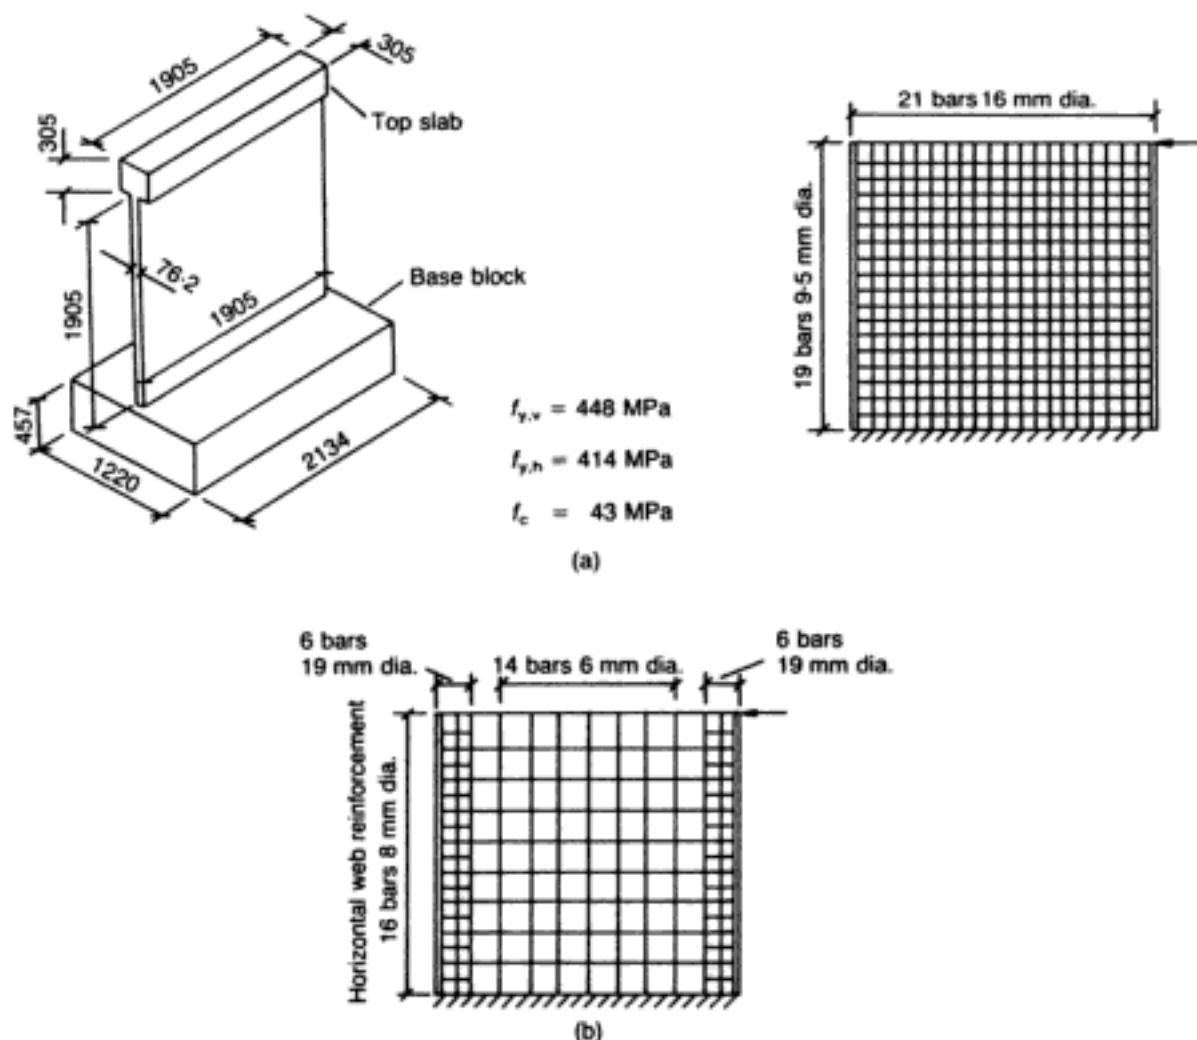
Structural walls: (a) design details of a typical wall investigated in reference 121 (all dimensions in mm); (b) reinforcement details of wall with strengthened compressive zone¹²²
